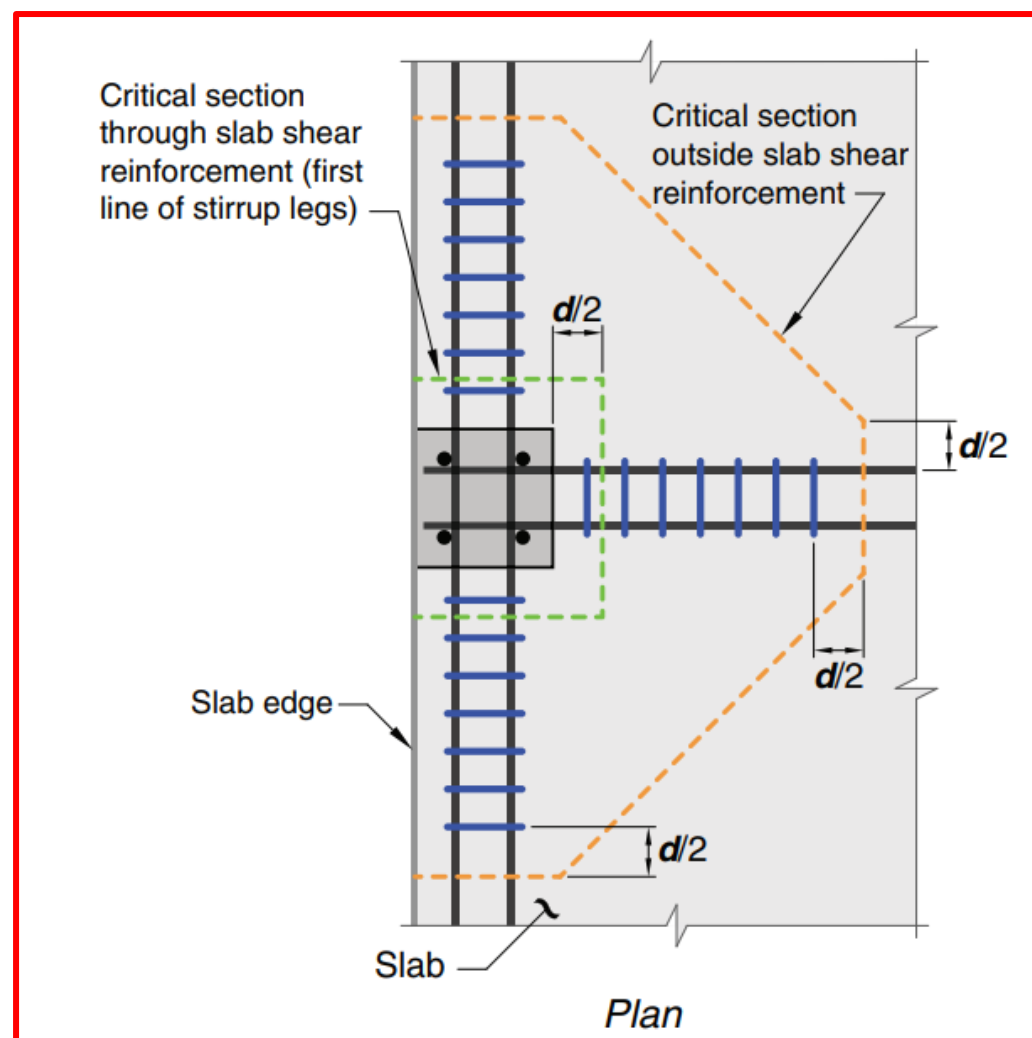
Critical sections for two-way shear in slab with shear reinforcement at edge column.
